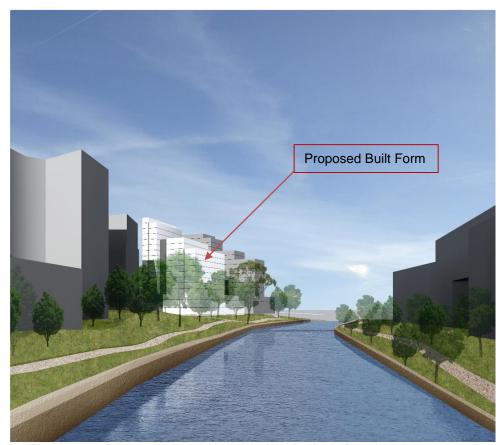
The proposed design concept illustrating the building form in relation to the Parramatta River and adjoining development.
